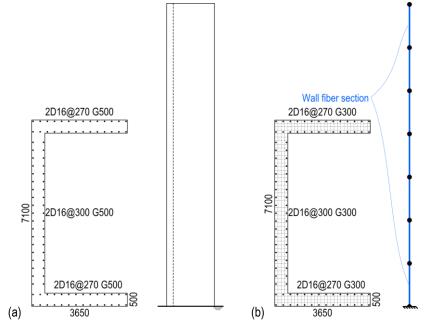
Building E. Sketches of (a) the structural solution and (b) the nonlinear model.
